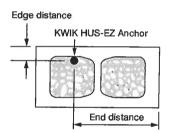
Edge and end distances for the KWIK HUS-EZ anchor installed in the top of CMU masonry wall construction
